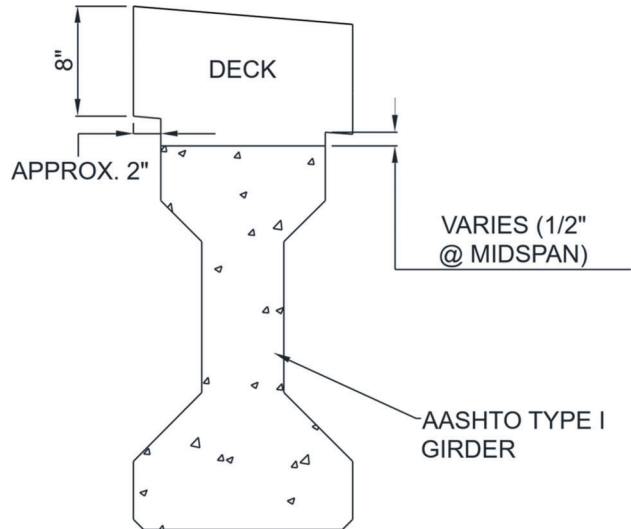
Cross section of test specimens (adapted from INDOT, 1987).
